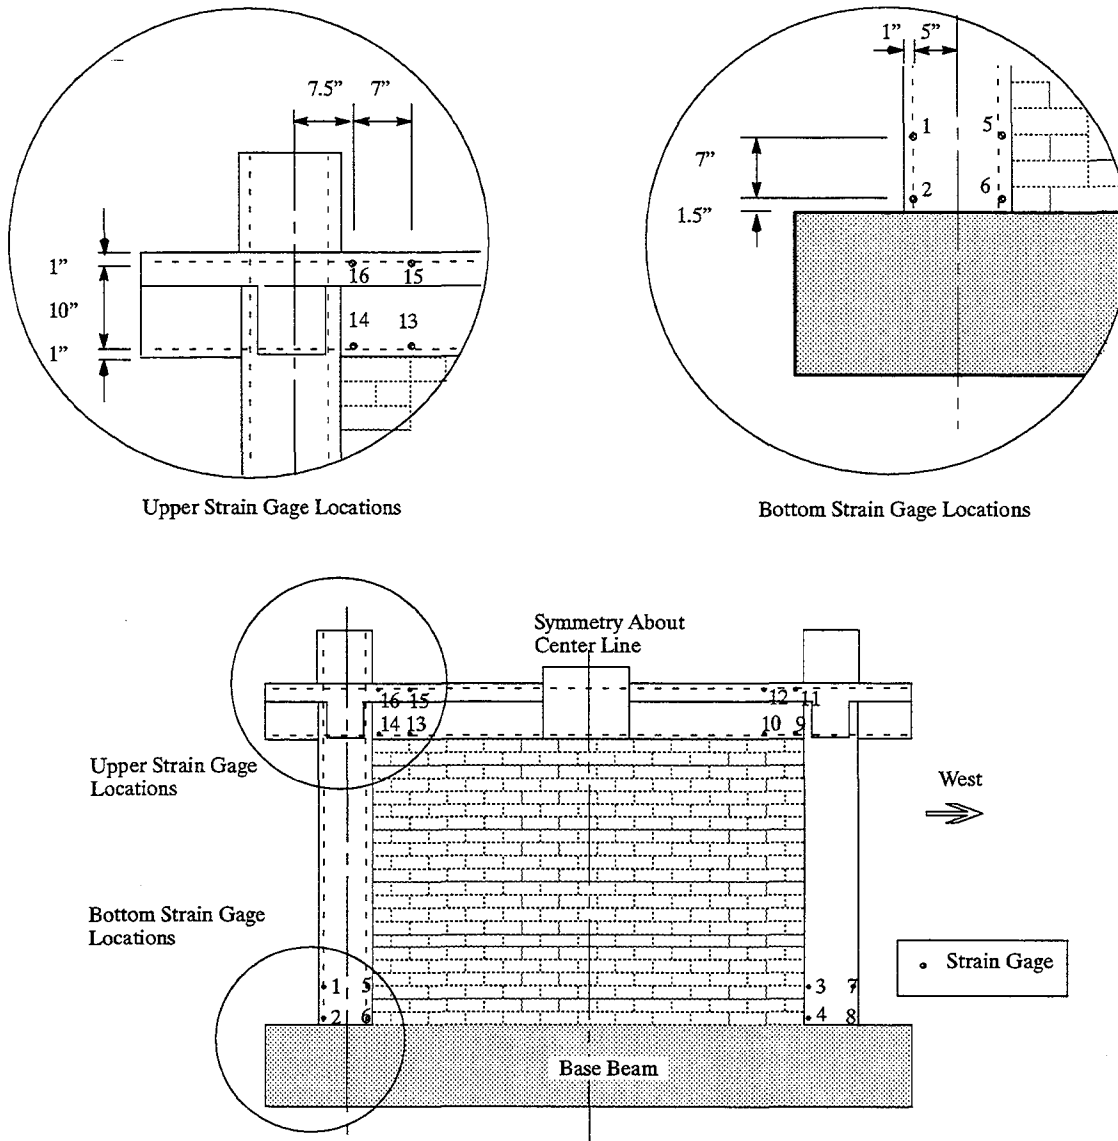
Reinforcing Strain Gage Locations For Concrete Frame
